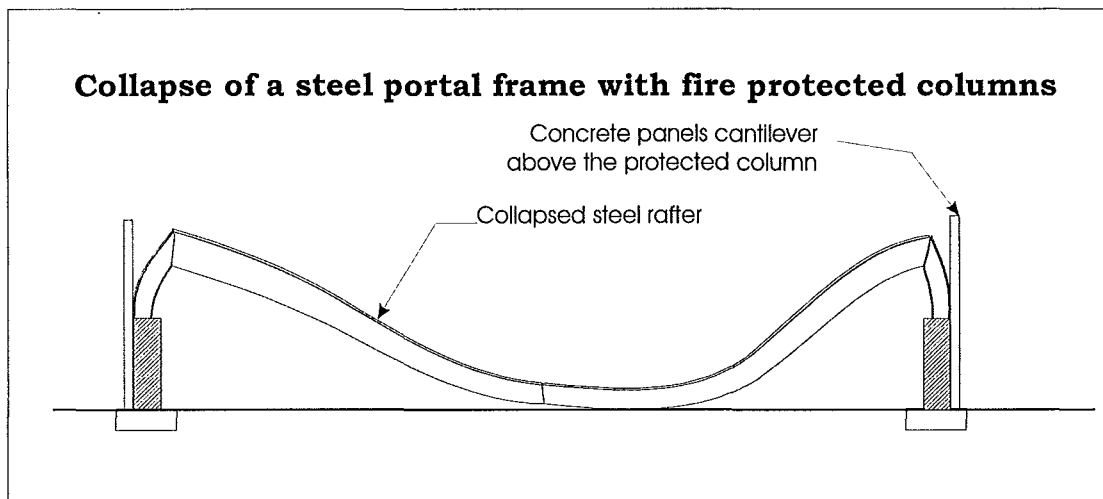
Collapse of a steel portal frame with fire protected columns.
